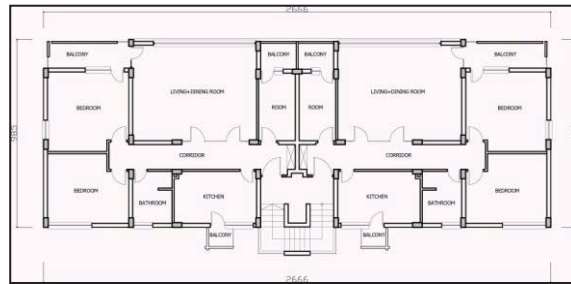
Floor plan layout of SD (Source: İSDEMİR Archive, 2012 and revised by author)
